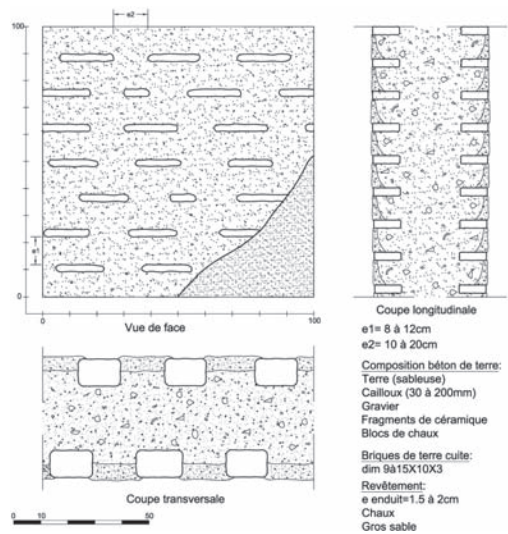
Section of a wall face with alternating layers of brick and lime mortar: plan and sections. (Alliche, S., 2011).
